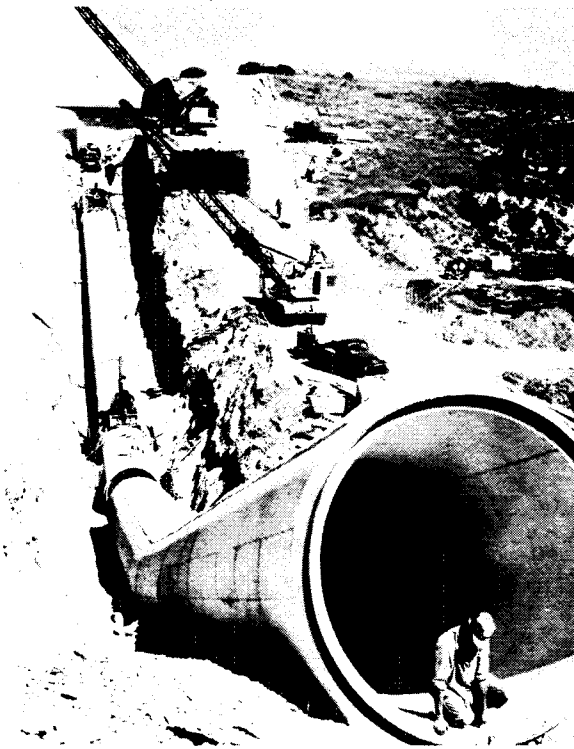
Inverted siphon under construction. P-328-701-7259A.
